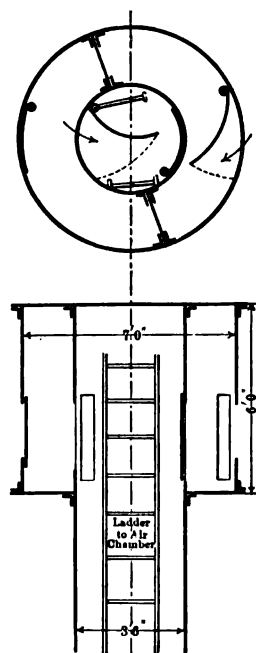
AIR-LOCK, FORTH BRIDGE CAISSONS.
